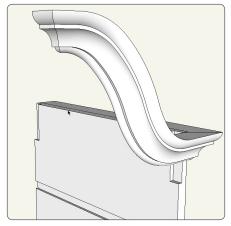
Once you remove the waste, you will have a gooseneck molding like this.
